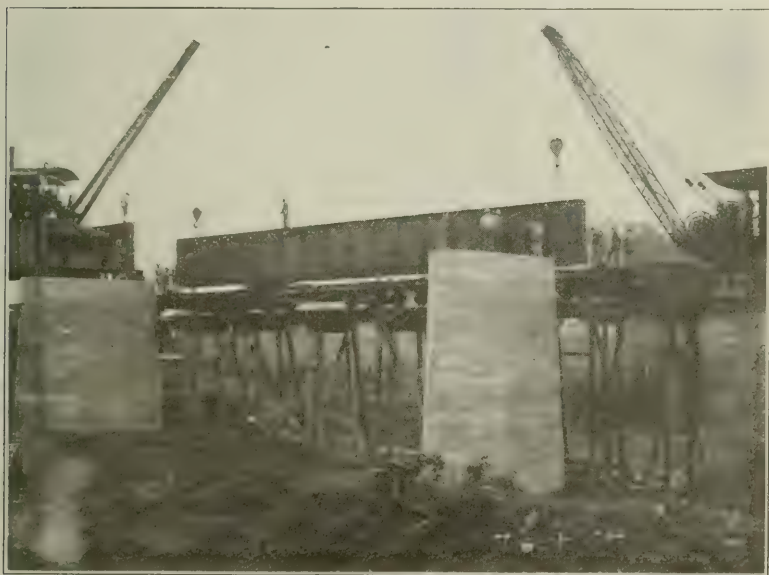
PLACING A GIRDER BRIDGE WITH LOCOMOTIVE CRANES.
